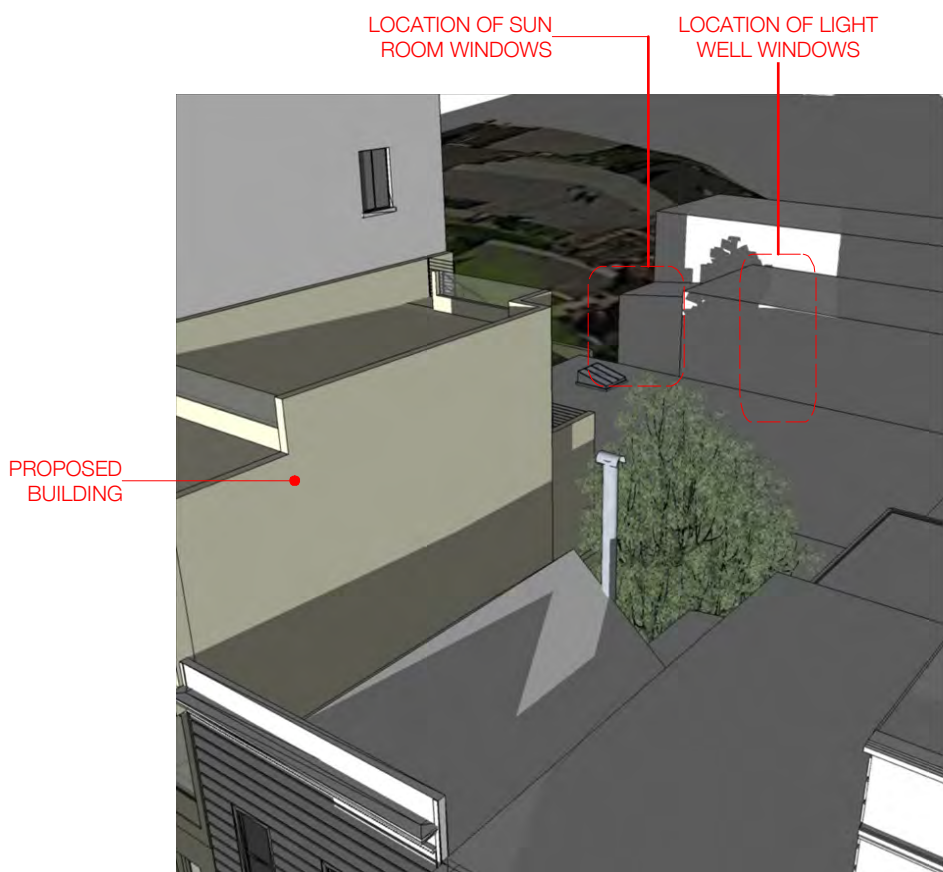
PROPOSED SHADOWS - DEC 1ST, 4:30PM
